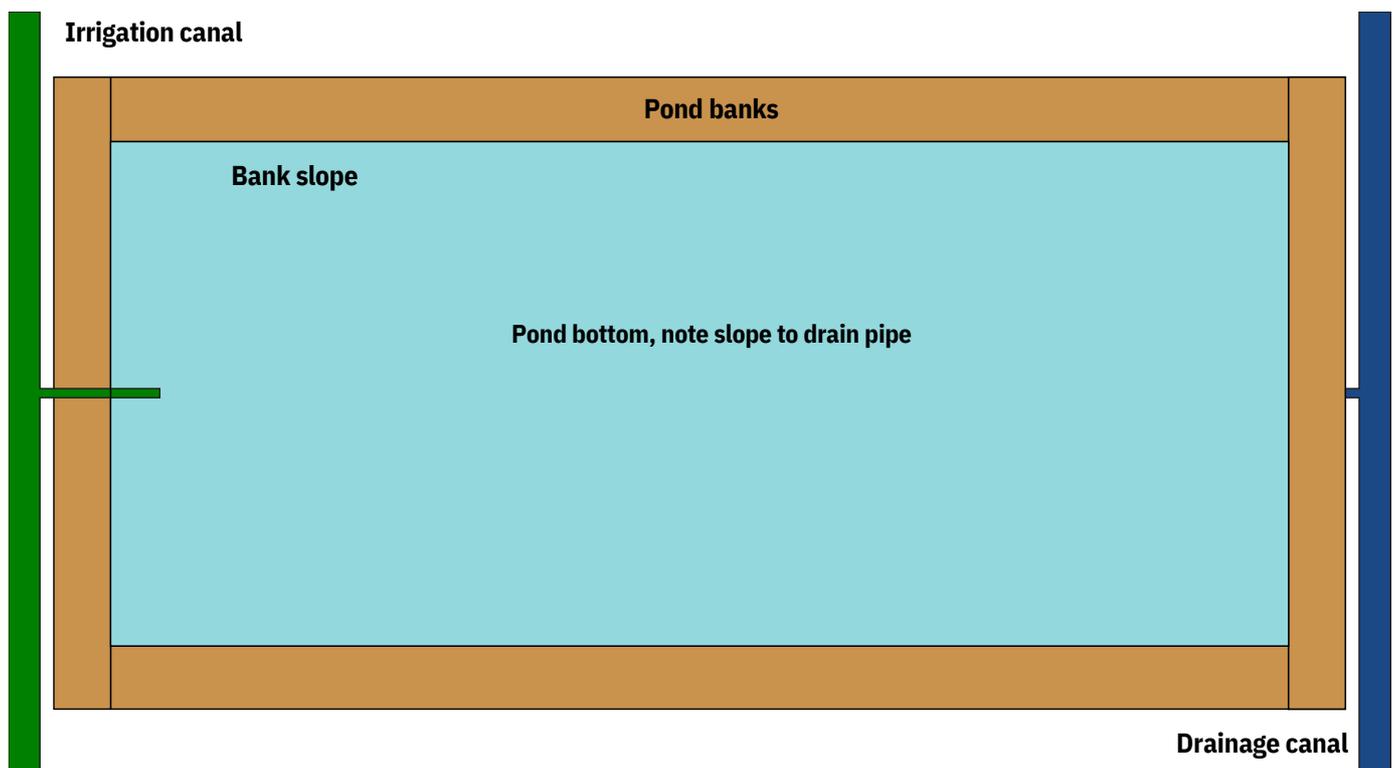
Pond layout with water inlet and outlet, sloped bottom toward the drain, and the ditch canal in the middle for easy harvesting.
